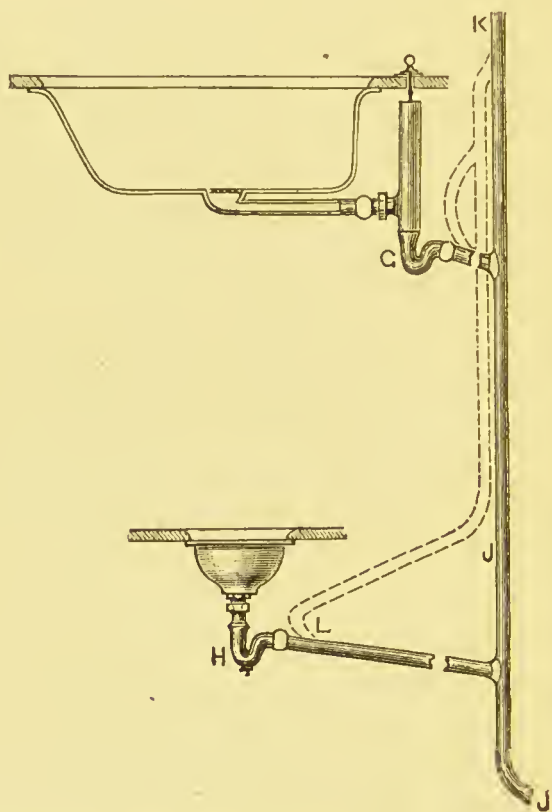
View of bath and lavatory waste, as used for testing trap-syphonage.
